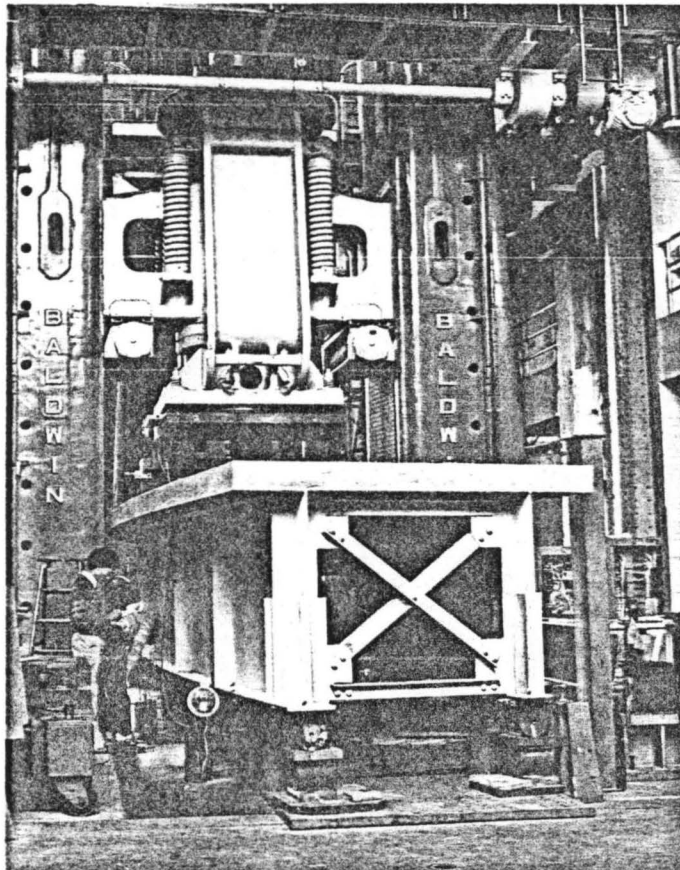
Composite Assembly 4 under Test in the Baldwin Universal Testing Machine
